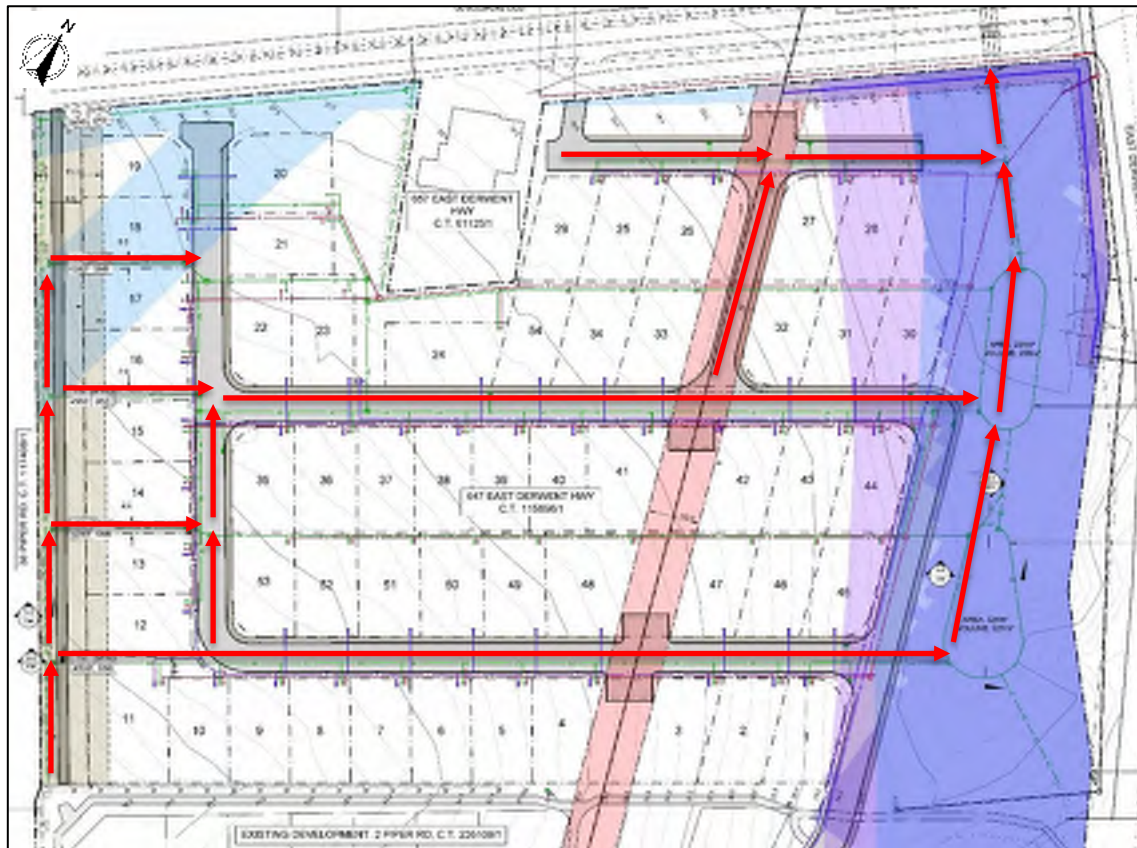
Part of proposed site plan C02 (red arrows show direction of overland flow)
